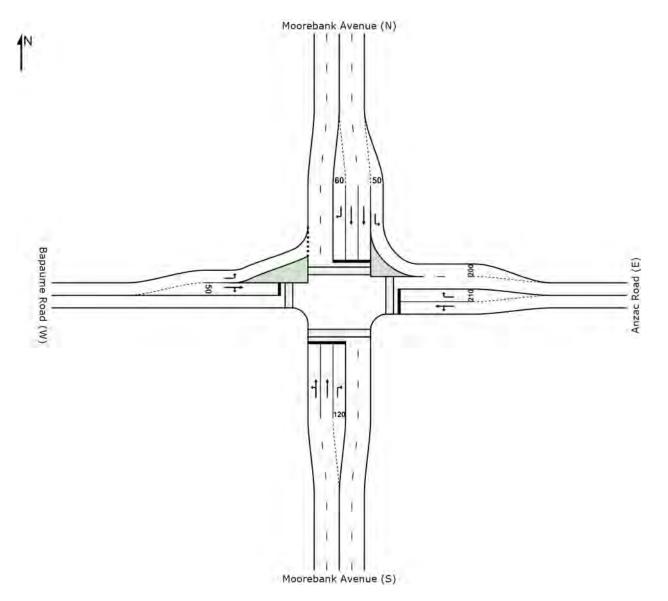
Proposed Moorebank Avenue, Anzac Road and Bapaume Road intersection
